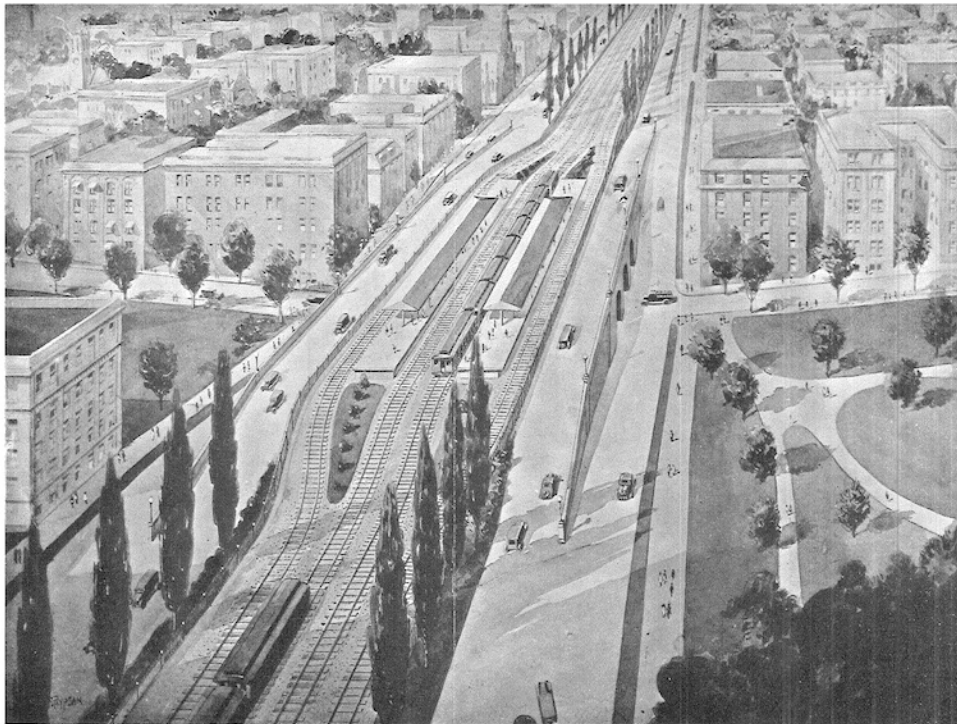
Aerial view of the 1924 Detroit “super-highway” plan. This plan combined automobile and rail traffic, with sparse vegetation separating buildings, highway, and rail. *Proposed Super-Highway Plan for Greater Detroit* (Detroit MI: Rapid Transit Commission, 1924).
